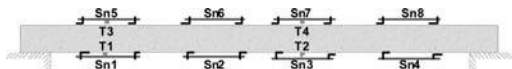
Sensors location on the Beam A (Sn: SOFO sensor; T: thermocouple).
